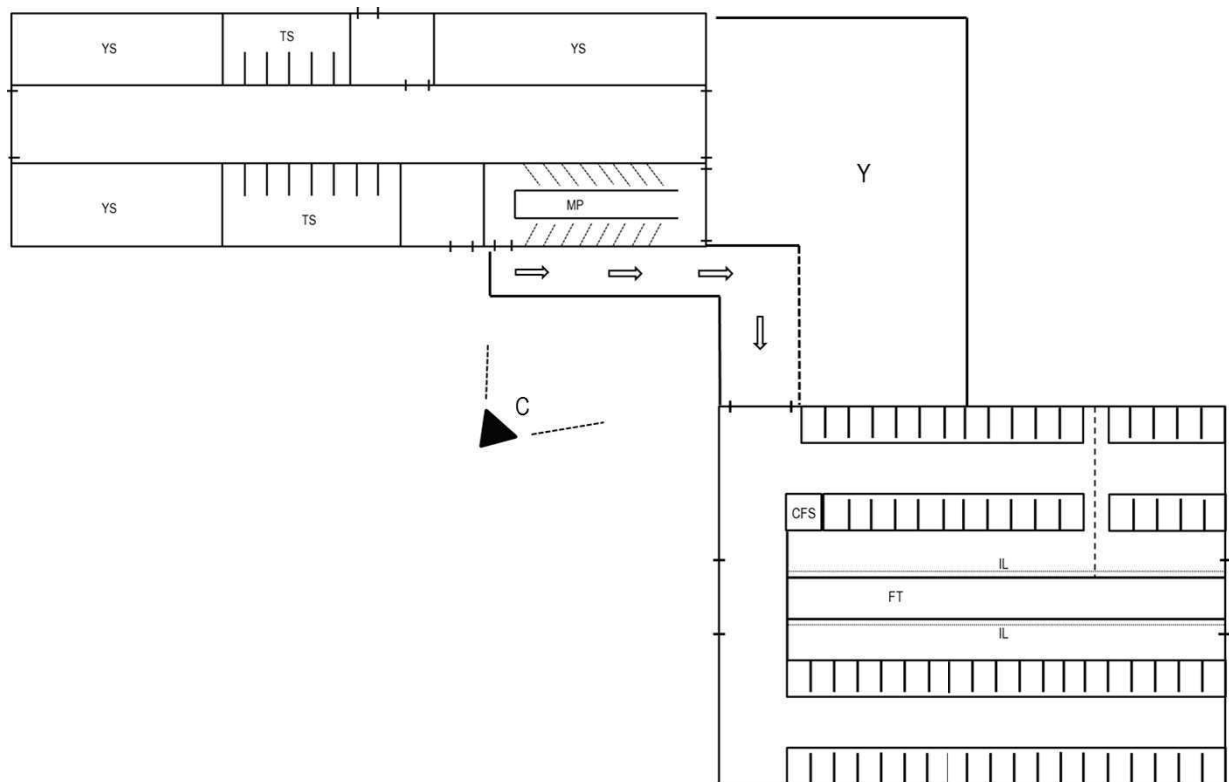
Sketch of floor plan of commercial dairy farm 1.
